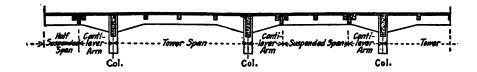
Continuous Reinforced Concrete Girder Bridge.
